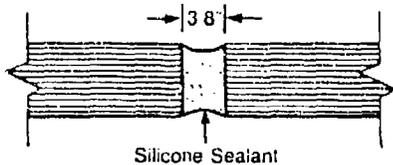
TYPICAL METAL BUILDING APPLICATION
